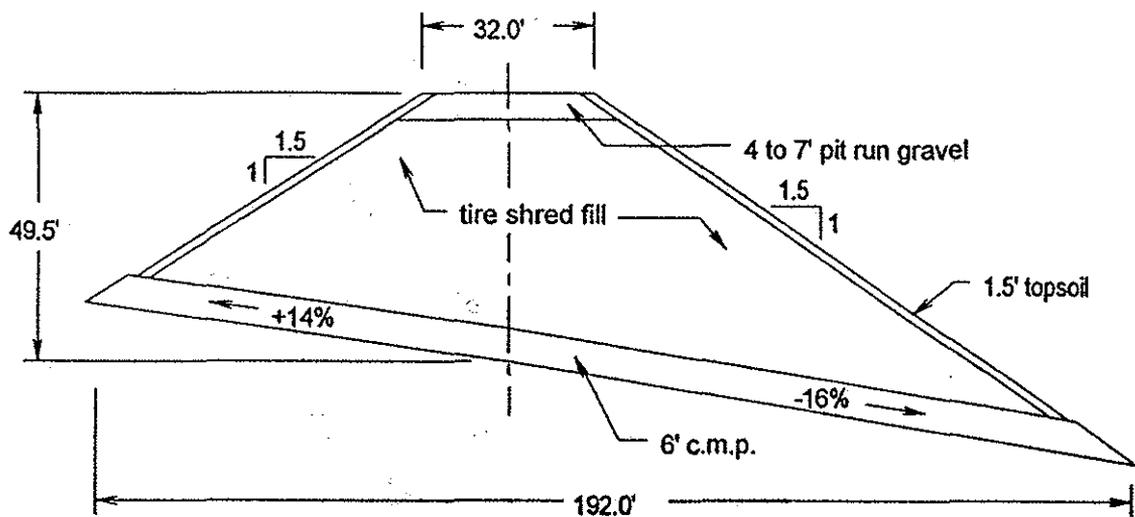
Cross section through tire shred fill on Falling Springs Road in Grafield County, Washington (Humphrey, 1996).
